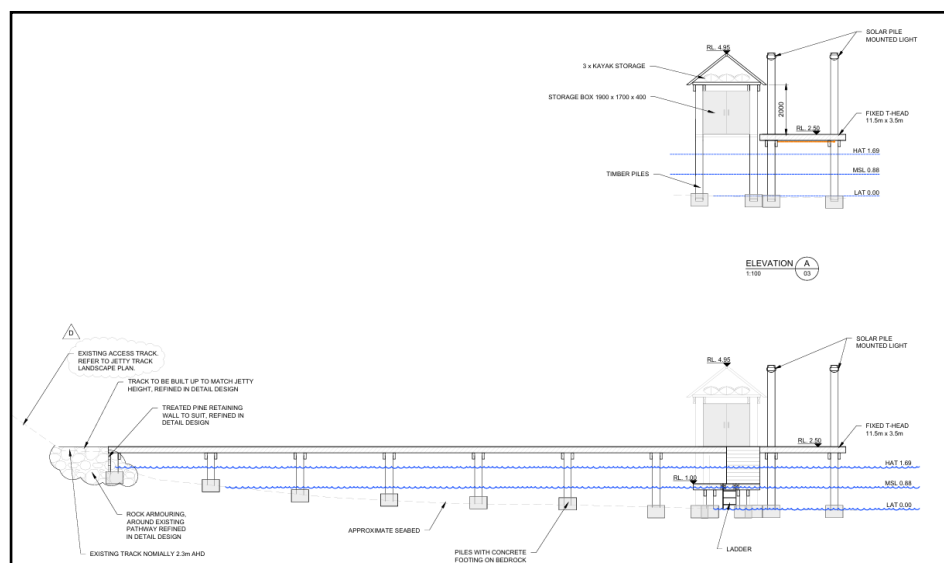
Elevations of the proposed jetty, t-head and boat shed (Burbury).
